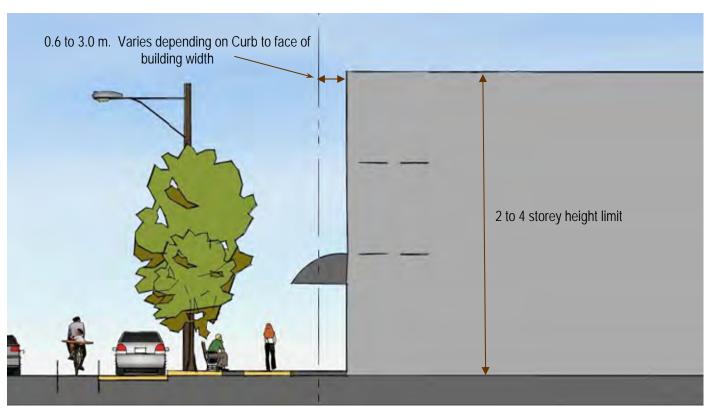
Building setback may vary depending on the character of the street, the adjacent development and the boulevard width of the street it is fronting on to ensure a good pedestrian realm.
